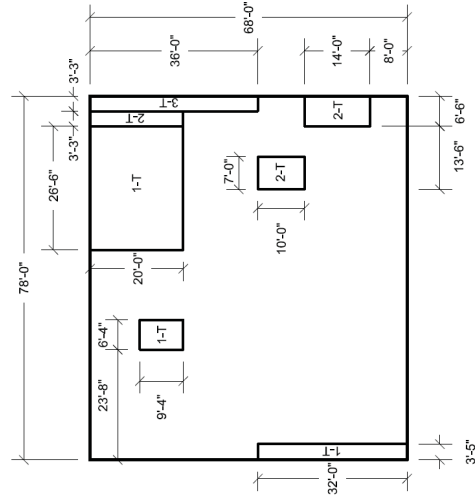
H.6-70: PUMP HOUSE WEST WALL LOOKING EAST
